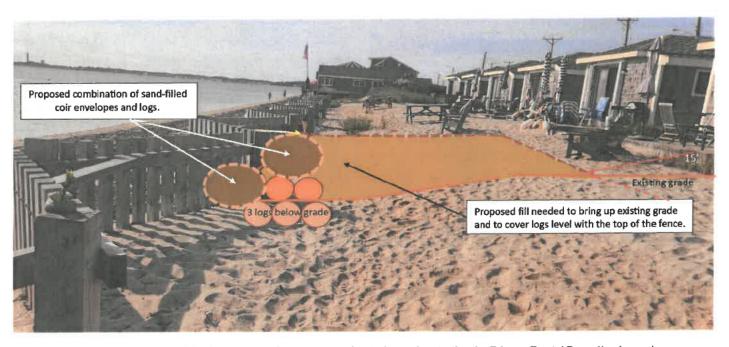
Detailed cross-section of the three proposed components of restoring and protecting the Primary Frontal Dune:1) coir envelopes; 2) coir logs; and, dune nourishment planted with beach grass.
